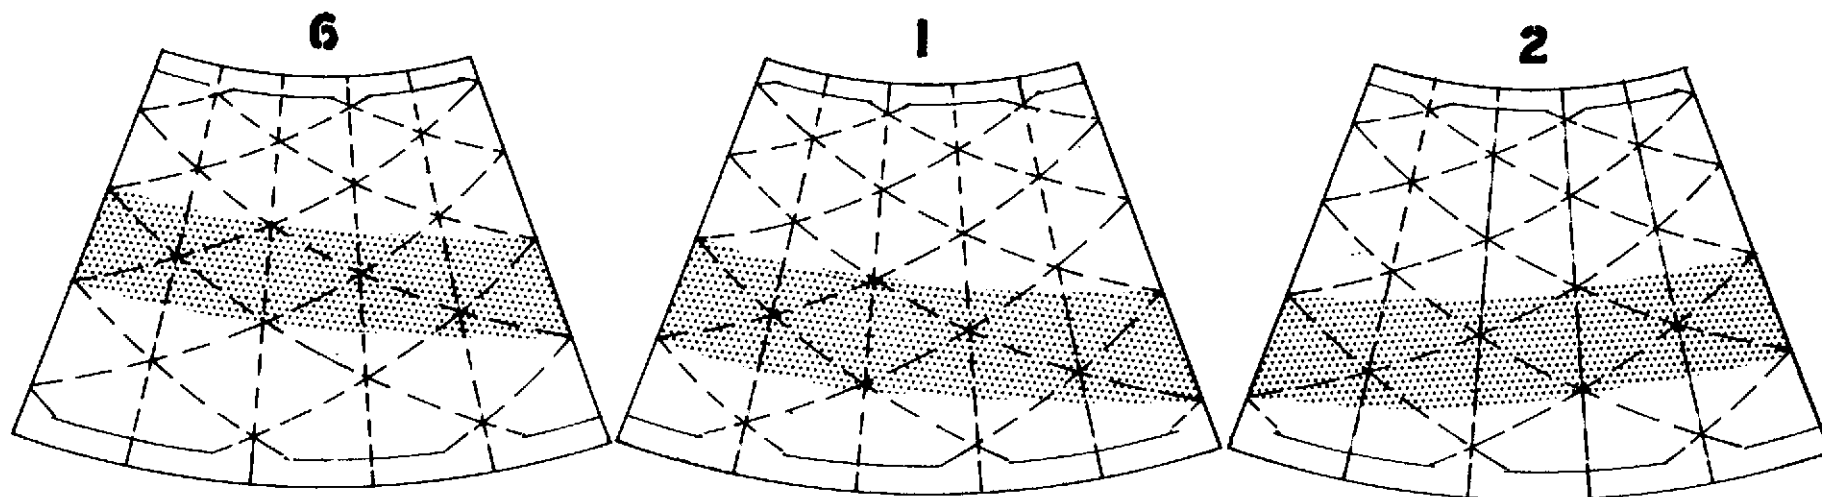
FAILED TEST SPECIMEN- PANEL 6
